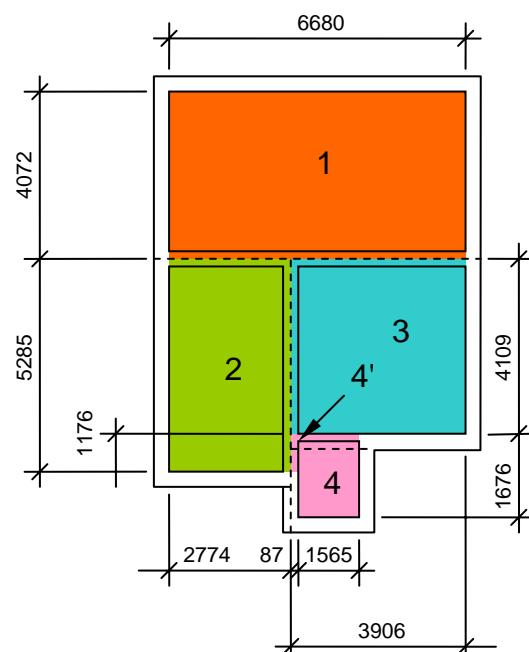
Subdivision of the ground floor plan used for calculating the area of the ground slab.
